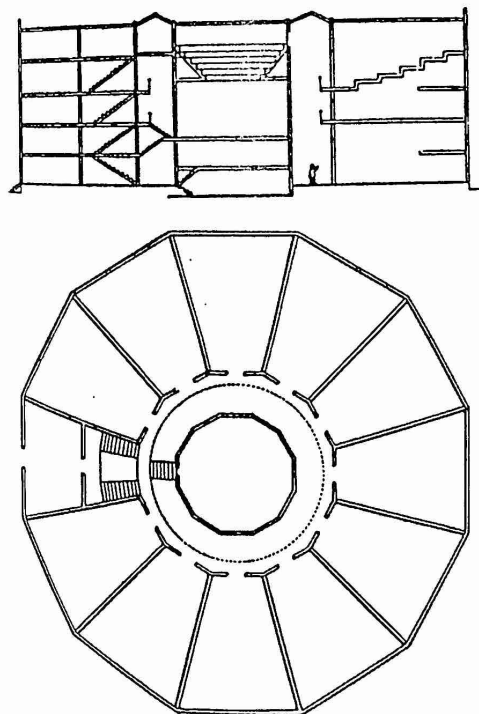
Jeremy Bentham, section and plan of the Panopticon Building, 1791
